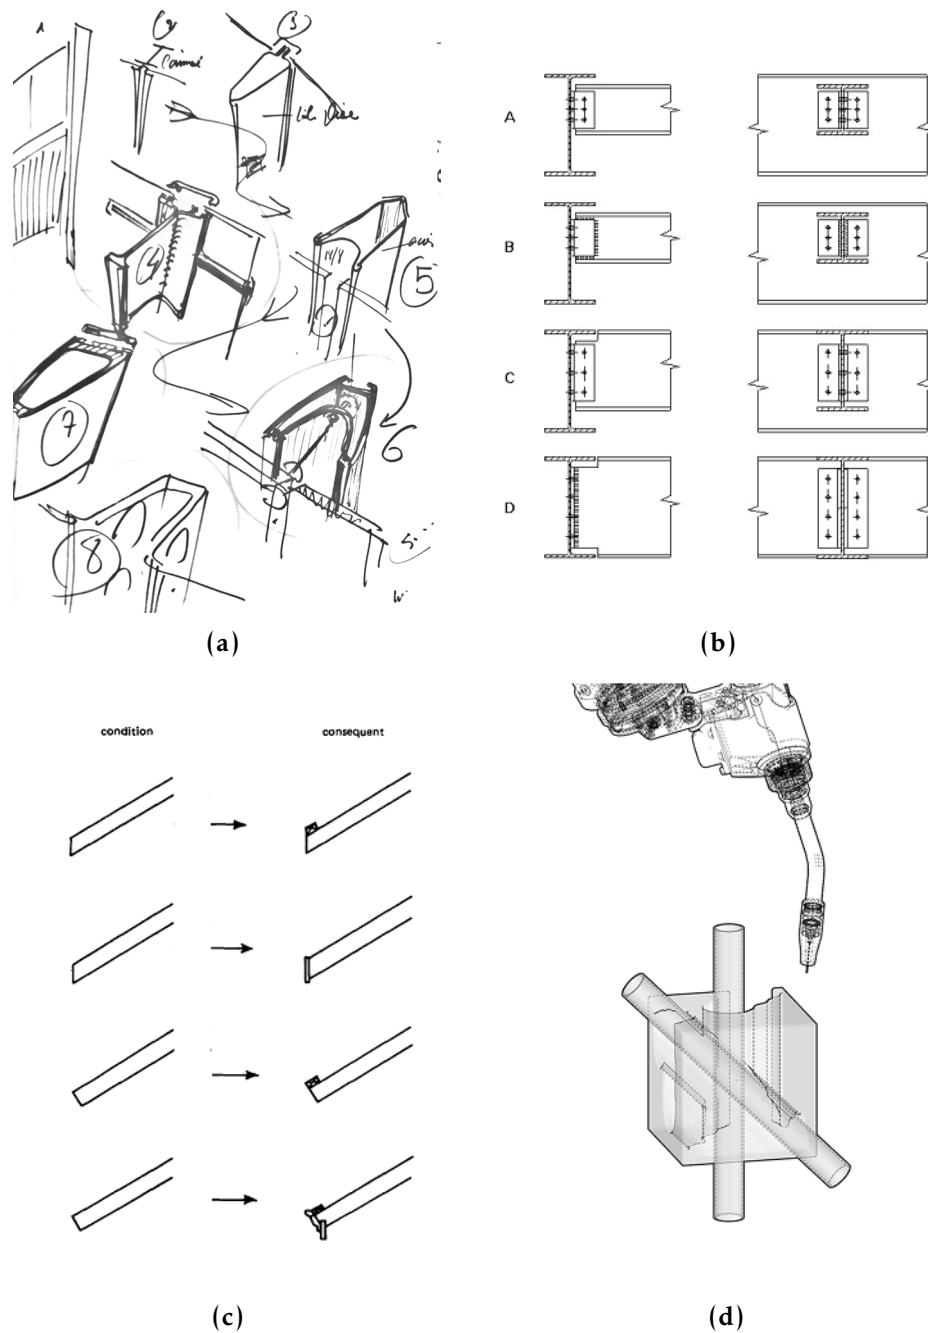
Detailing approaches: (a) Detailing through craftsmanship (Prouvé, 1990), (b) Detailing with recipes, Beam to beam connection design in steel (Connection Design Static Loading: Simple Connections for Buildings. 2000), (c) Expert detailing systems (A. Radford and Gero, 1985), and (d) Detailing with robotic constraints, Gramazio Kohler Research (2018).
